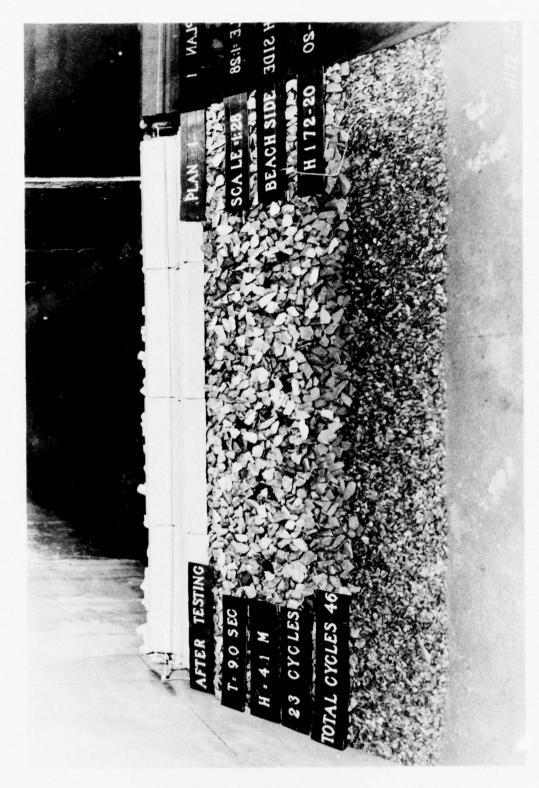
Beachside view of Plan 1 in the shallow-water location after attack of 9-sec, 4.1-m waves at a swl of 0.0-m PBD
